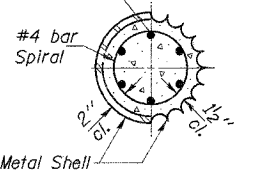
DETAIL OF CYLINDRICAL STEEL SHELL FOR CAST IN PLACE CONCRETE PILES
